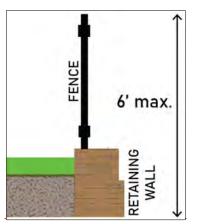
A-2-E-2-I: Requirement for fence location when retaining wall is not adjacent to walkway.
